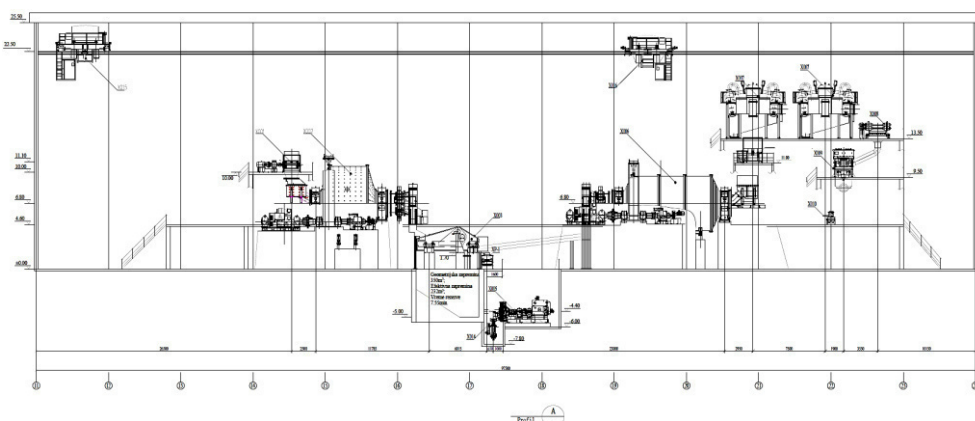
, Cross-sectional view of Čukaru Peki grinding plant
